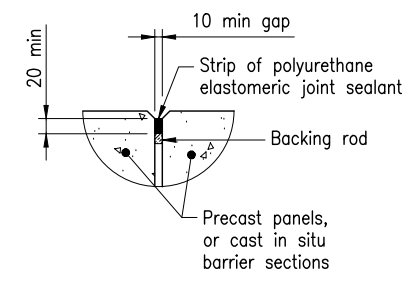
DETAILS FOR SHAPED PRECAST BRIDGE BARRIER PANEL
